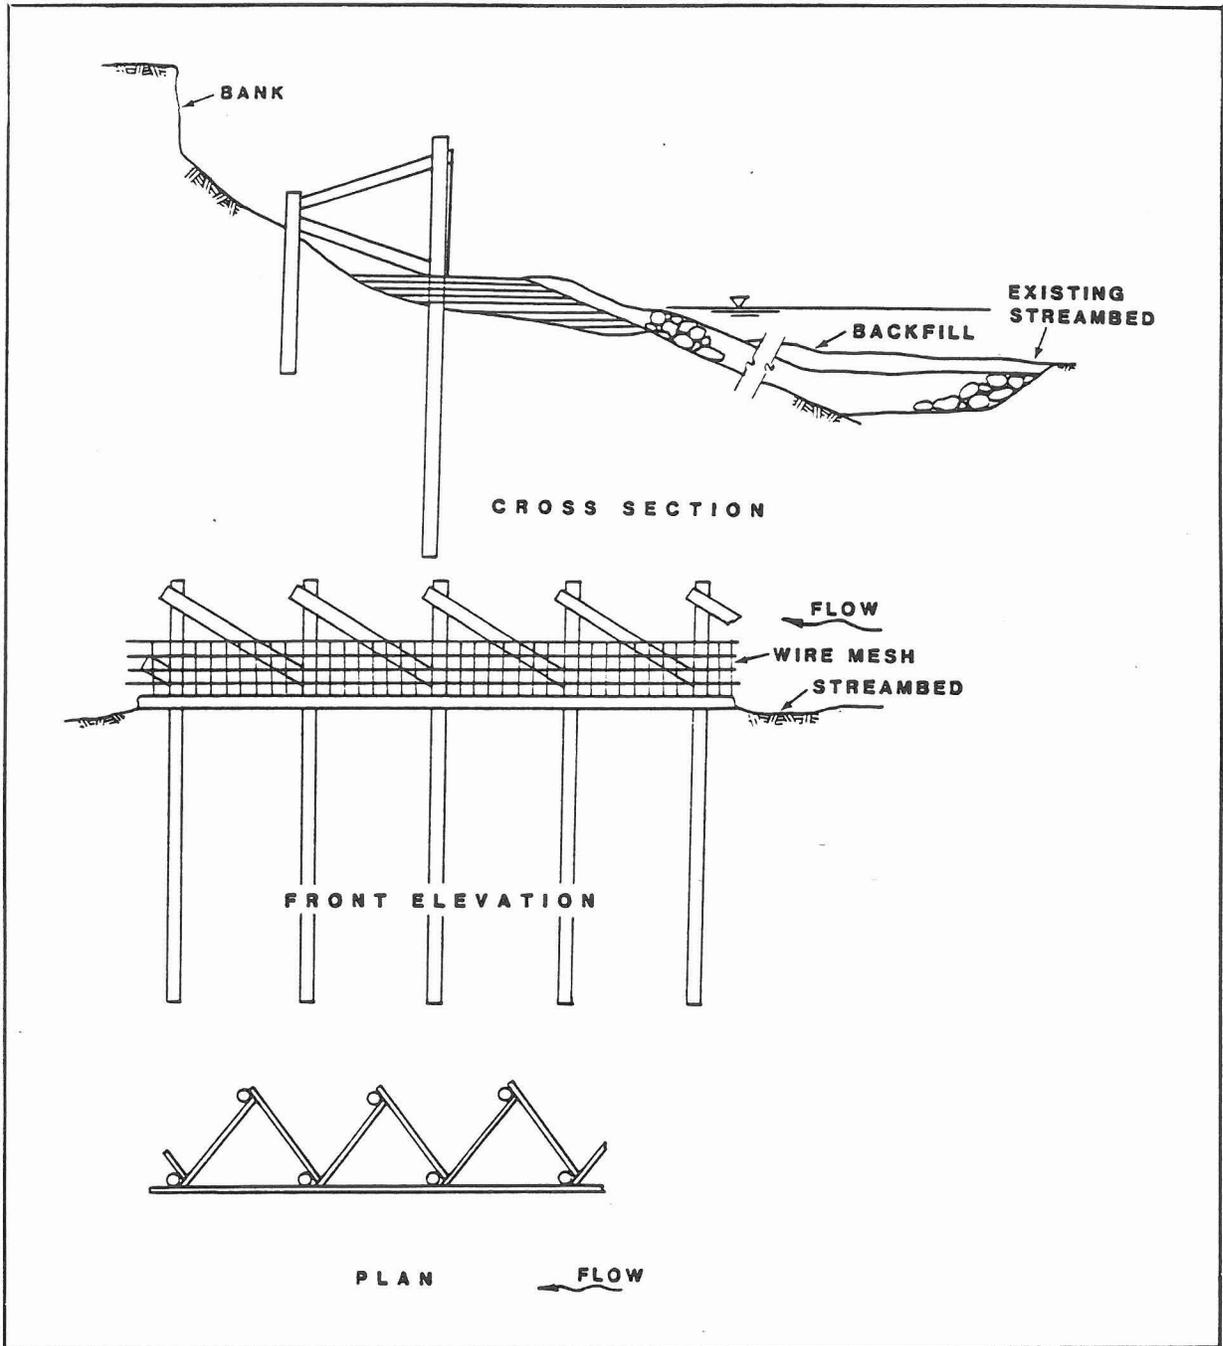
Heavy timber-pile and wire fence retarder structures (Modified from U. S. Army Corps of Engineers 1981; After [37]).
